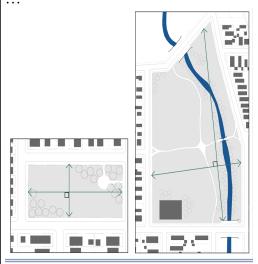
Outdoor Space: Measuring Minimum Dimensions
